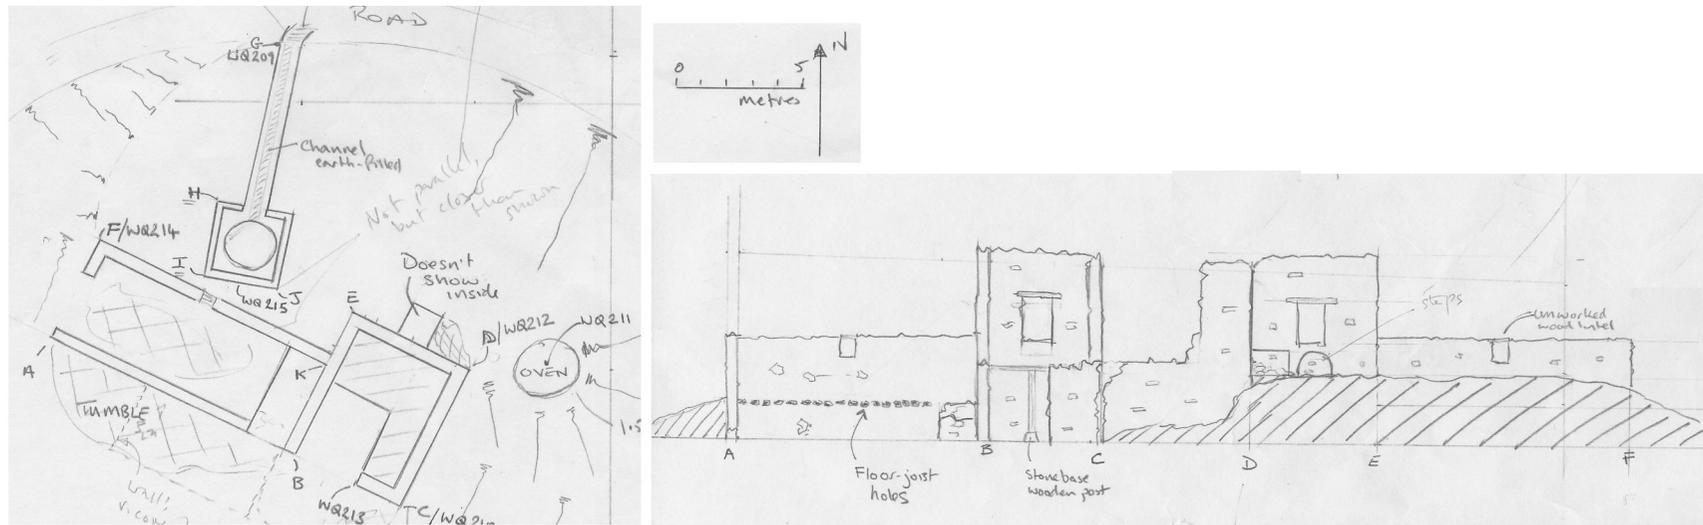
Sketch plan of mill at Koloni (SE0028).
